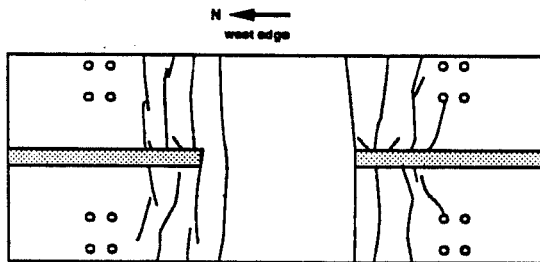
Sp. 2a: Progression of Cracking of Bottom Face of Roof Slab at Load Point 361
